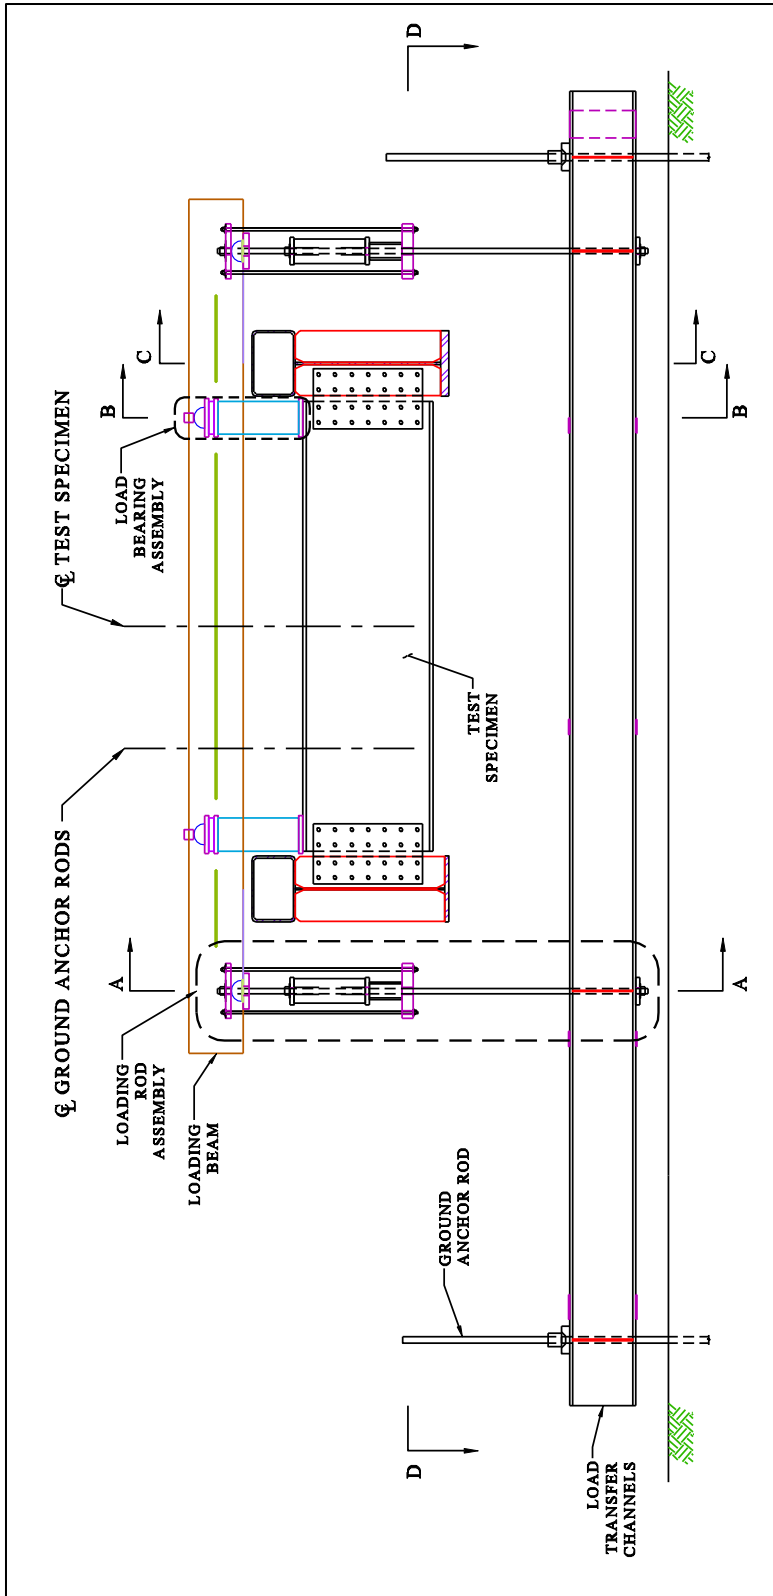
Parallel plane cross section view of test specimen and loading fixture
